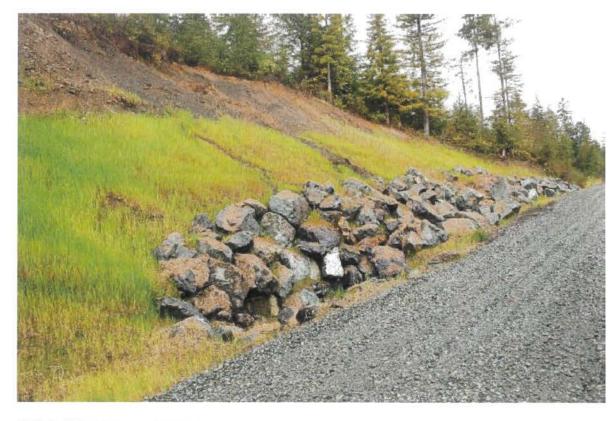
This wet and potentially unstable cut slope on a newly constructed road was stabilized using a buttress of large rock armor. To assure their effectiveness, rock buttresses and other retaining structures should be designed by a qualified engineer or engineering geologist.
